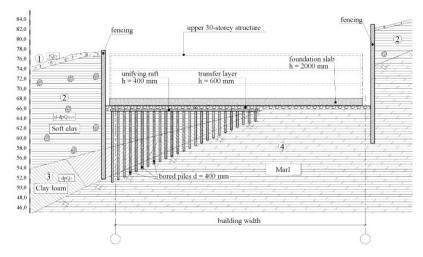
Section of the building combined with the base reinforced with reinforcing elements and an intermediate bed.
